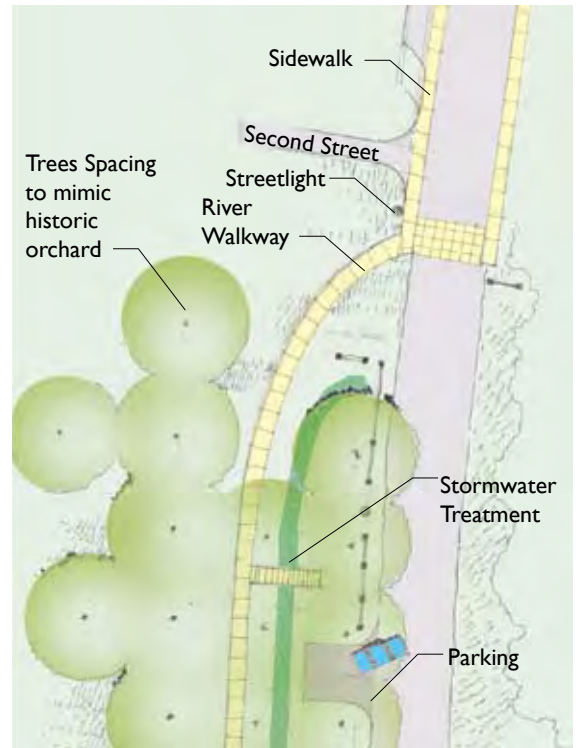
Plan Enlargement at Second Street and Boones Ferry Road
